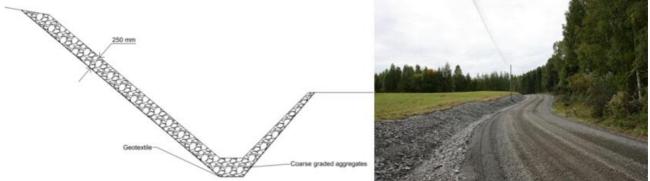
Improving slope stability and drainage using the "Standard ROADEX solution" to support the slopes and to make a long-lasting drainage system
